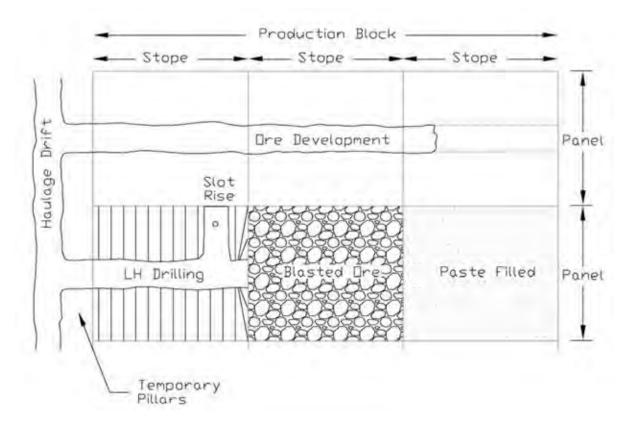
Mechanized Cut and Fill (plan view).
